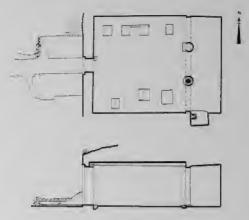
, Plan and section of Baqet III's tomb (After Newberry, Bern Havan 2, pl. 2)
